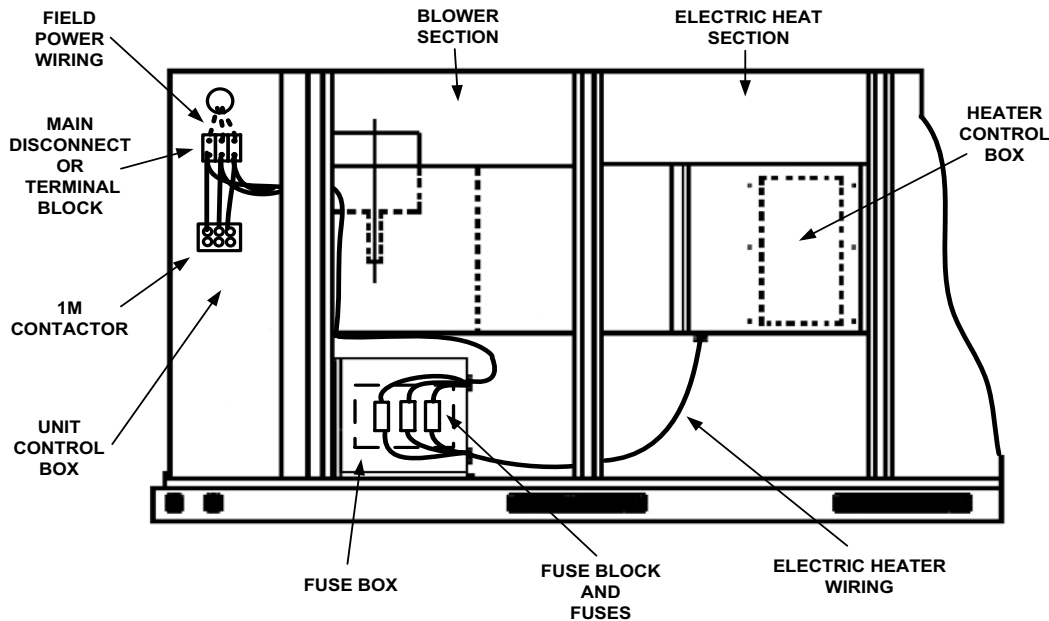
TYPICAL FUSE BLOCK INSTALLATION FOR DM/DF/DH 036 THRU 076, DL/DS/DU -03 THRU -A6 PACKAGED COOLING UNITS AND BQ 036 THRU 060, BB -03 THRU -05 PACKAGED HEAT PUMPS.
